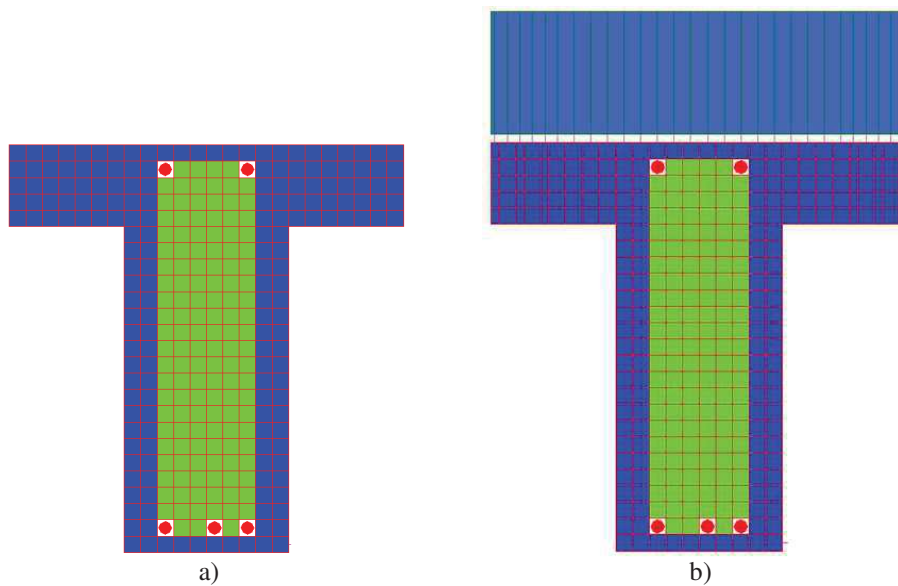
Finite element model for a) un-strengthened beam; b) strengthened beam with the SUREBridge solution.
